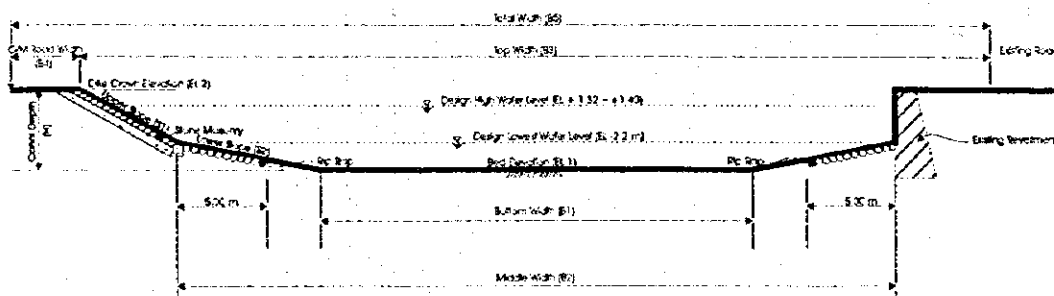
(1/2) TYPICAL DESIGN CROSS SECTION OF TAU HU - BEN NGHE CANAL IMPROVEMENT (1)
